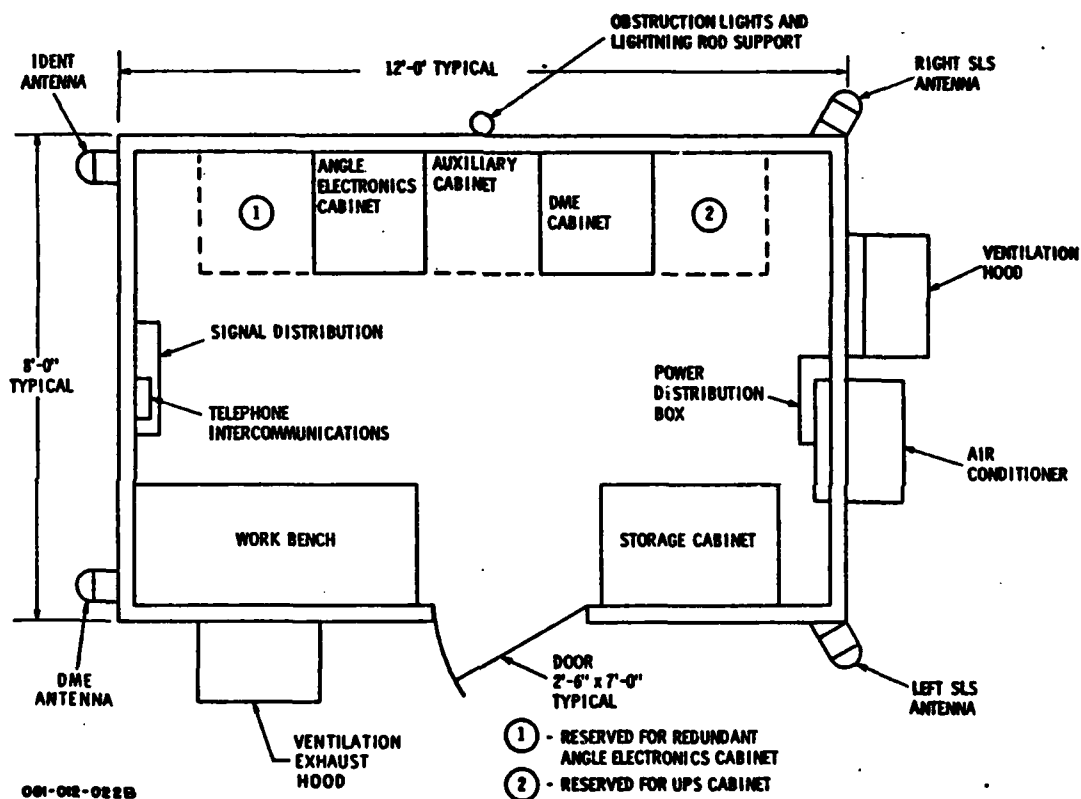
AZIMUTH EQUIPMENT SHELTER, PLAN VIEW
